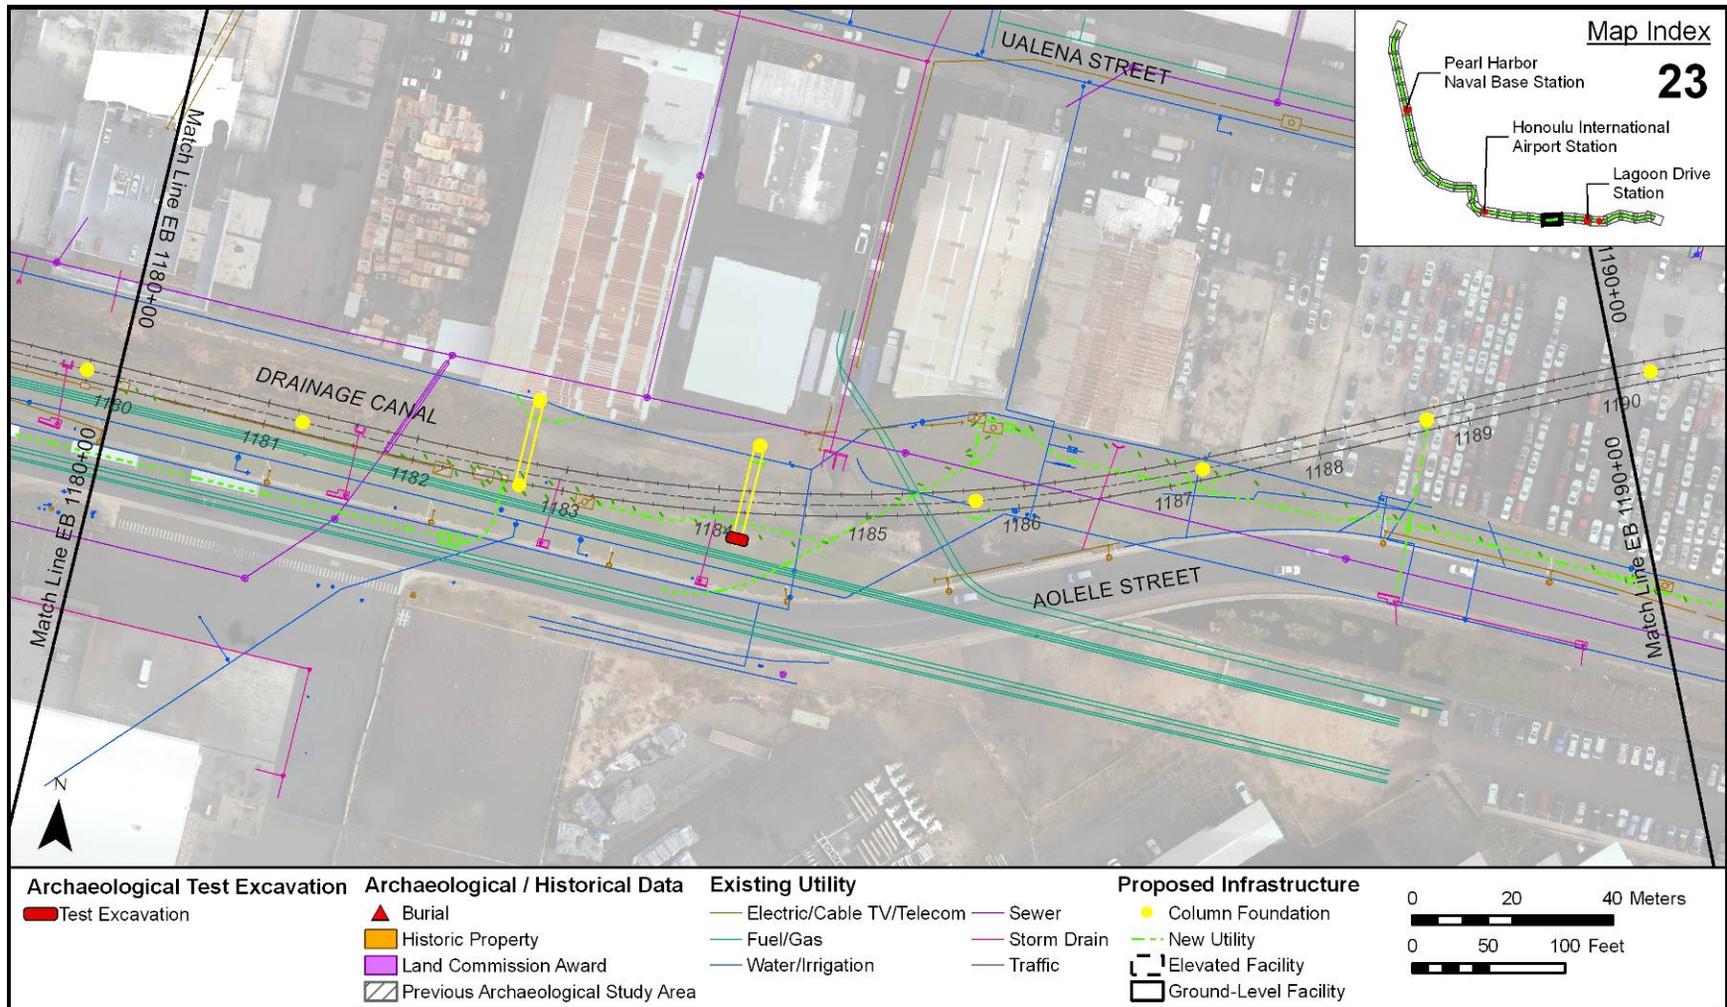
Map Sheet J 23, one 10x3 excavation at (*makai*) column foundation @ 1184+20
